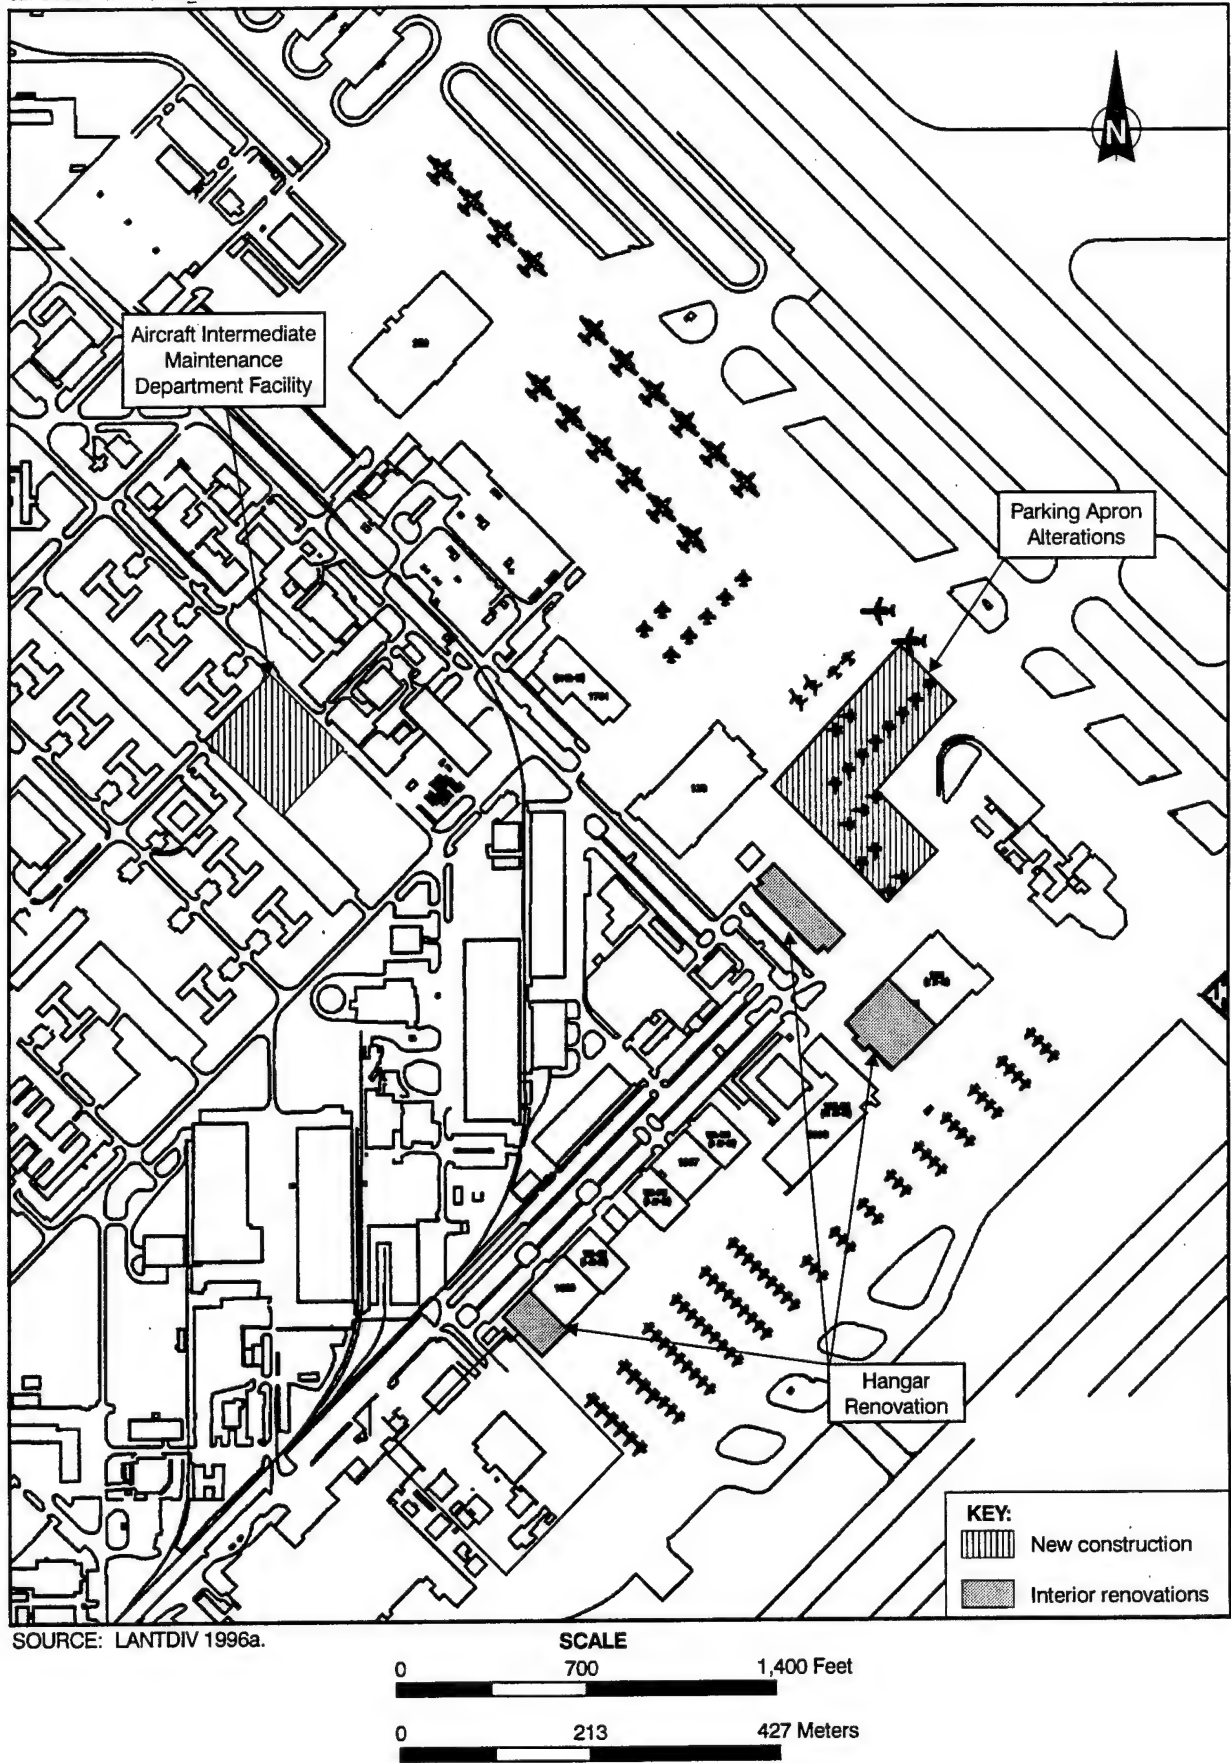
CONSTRUCTION NEEDED AT MCAS CHERRY POINT TO SUPPORT ARS 3
